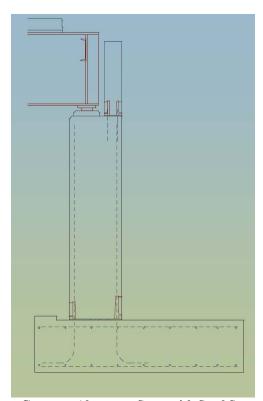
Diagram of Precast Concrete Abutment Stem with Steel Superstructure [50]
